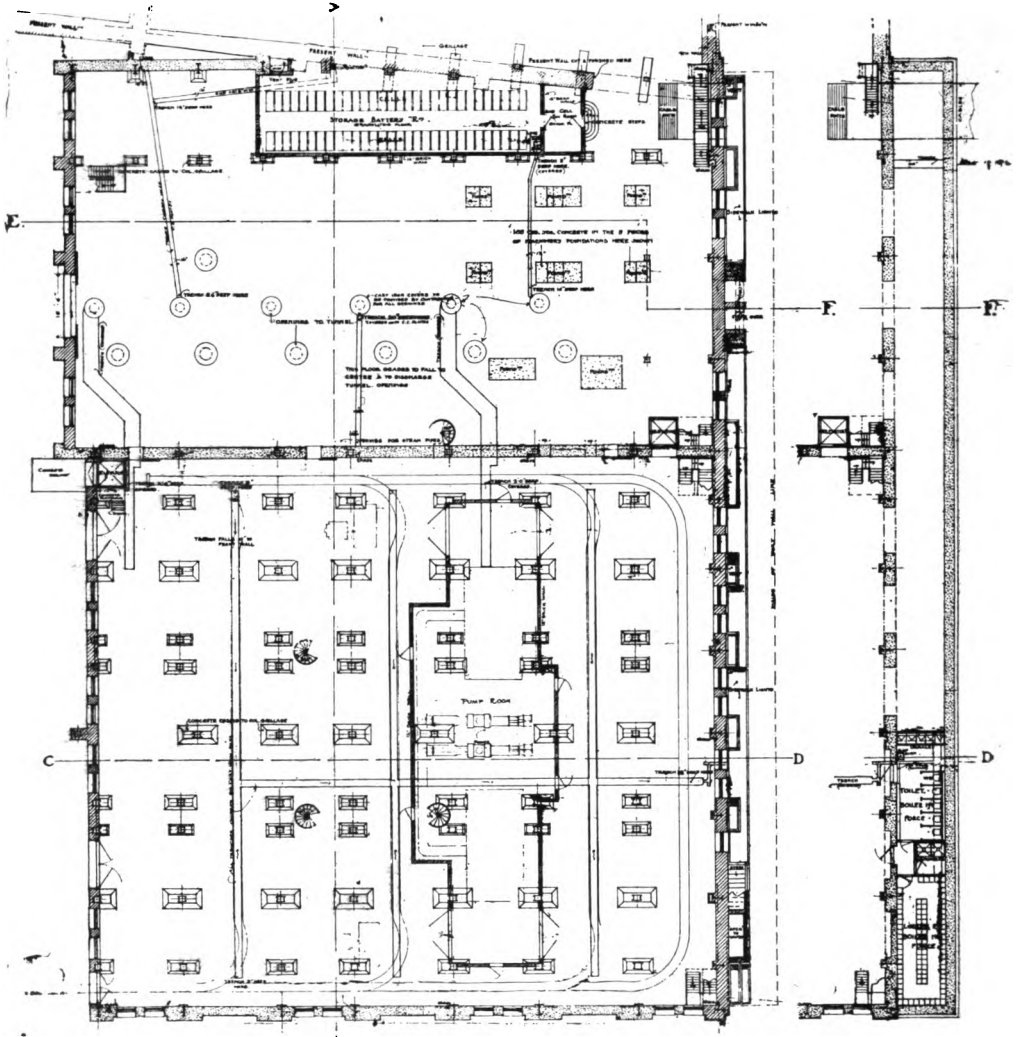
Plan of Basement Floor, Williamsburg Station.
